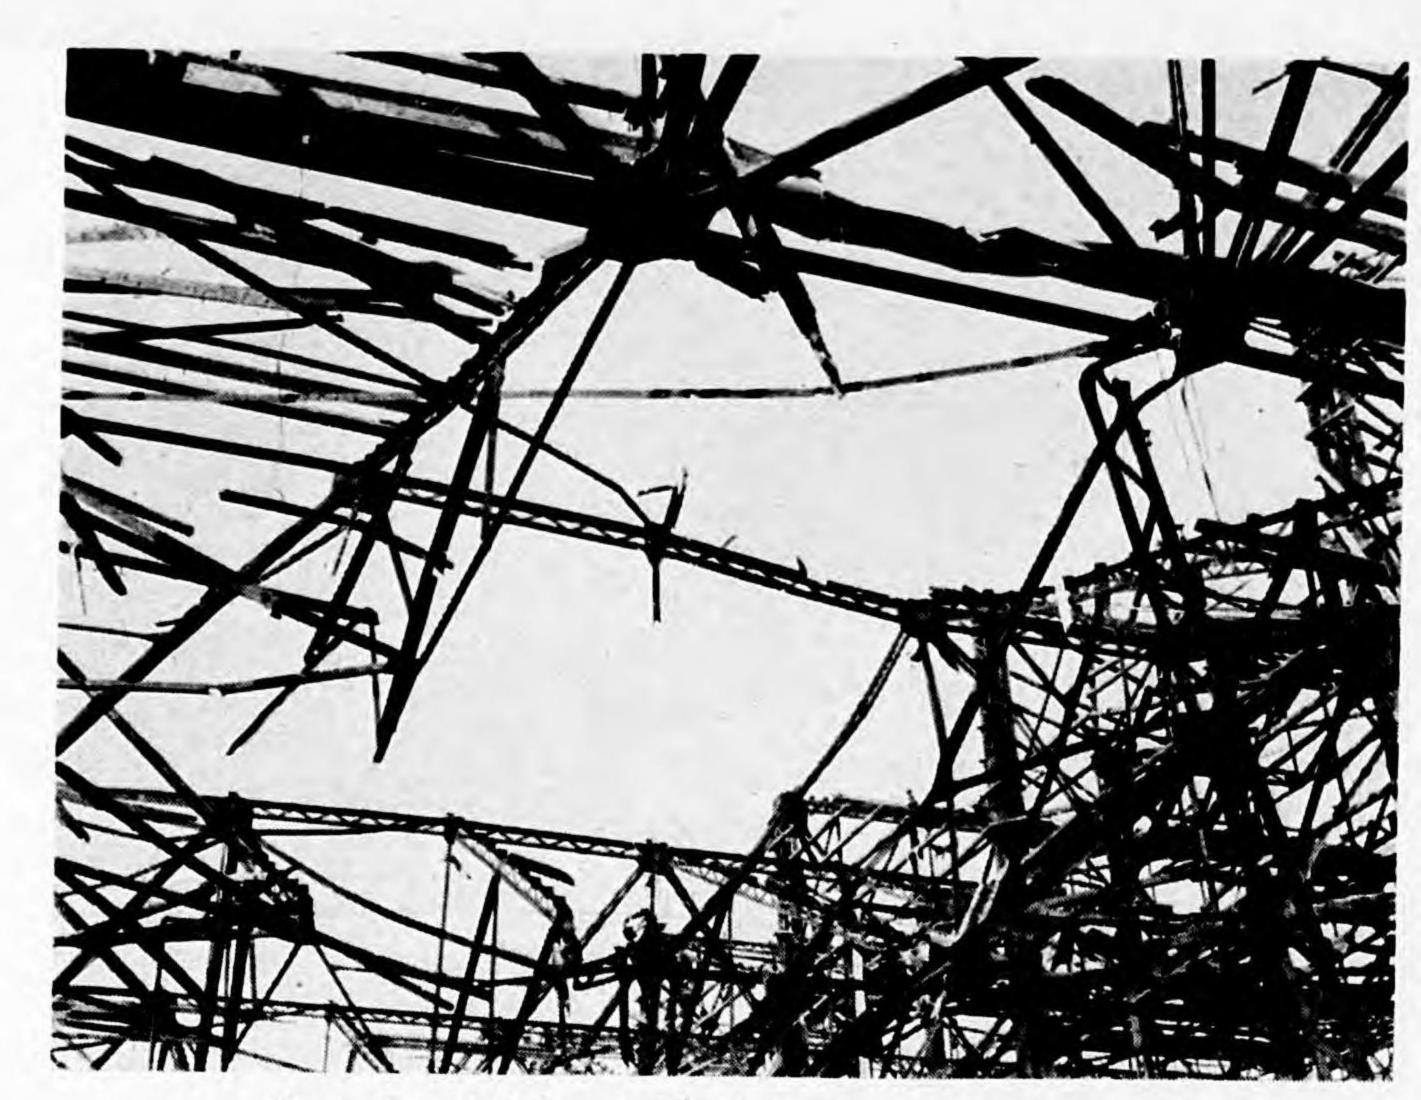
Building 2, Bomb 8; damage to roof steel.
